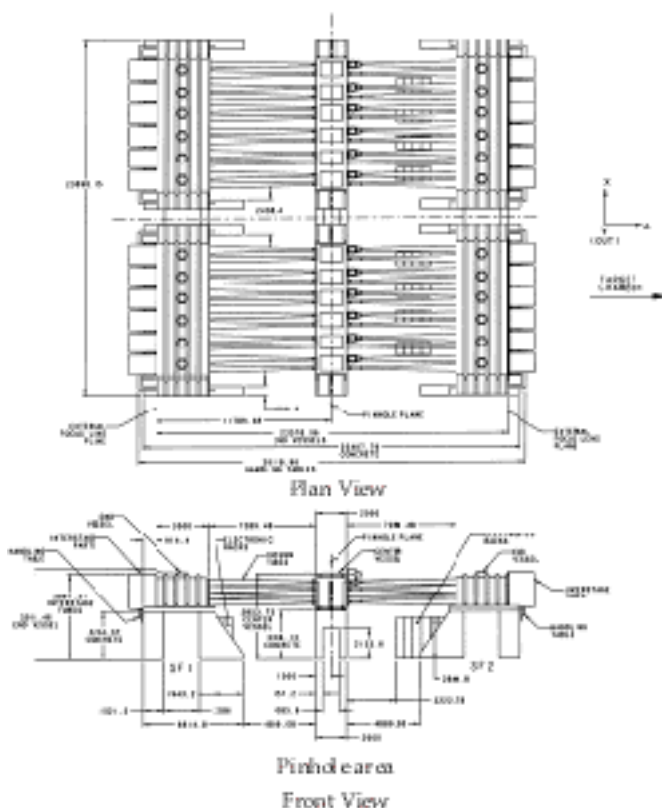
Plan and elevation of the CSF support structure. (40-00-1097-2297pb01)
